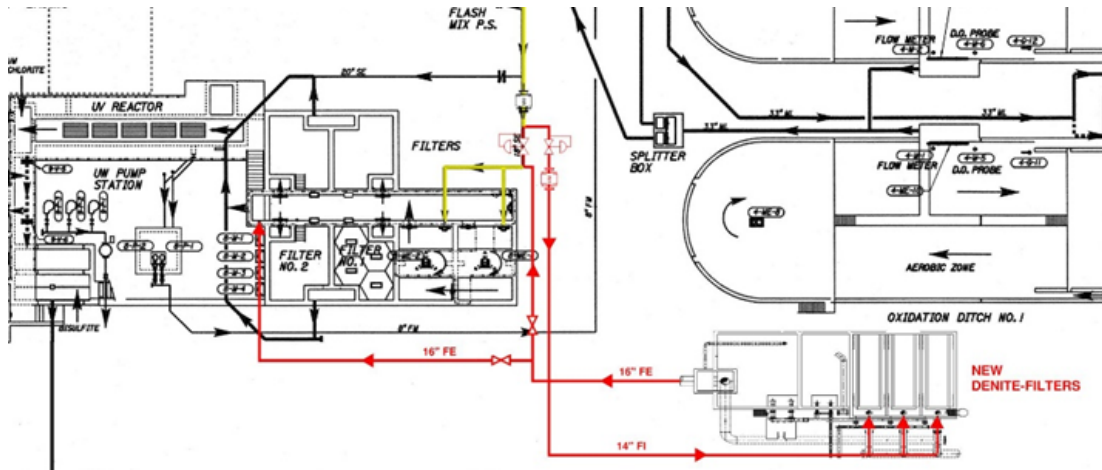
Schematic of Piping Arrangement for Alternative 1A
